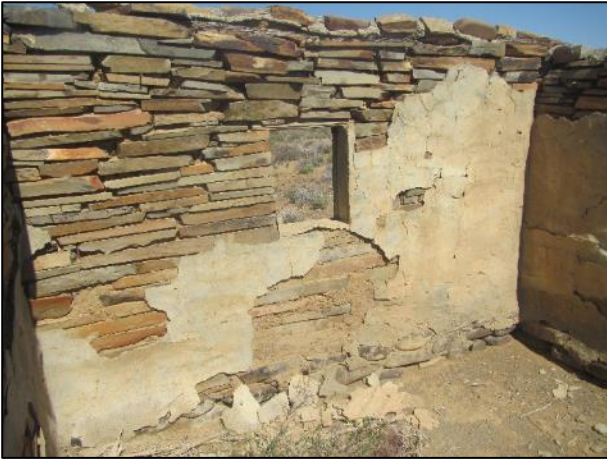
Inside detail of the ruin at waypoint 158 showing stonework and plaster.
